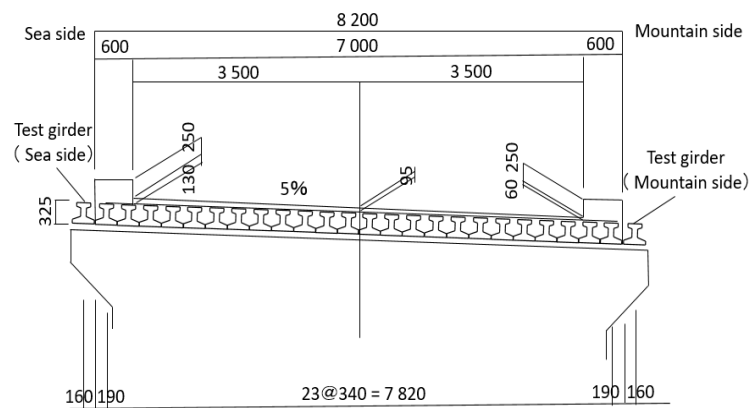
Cross-section of Shinmiya Bridge (unit: mm)
